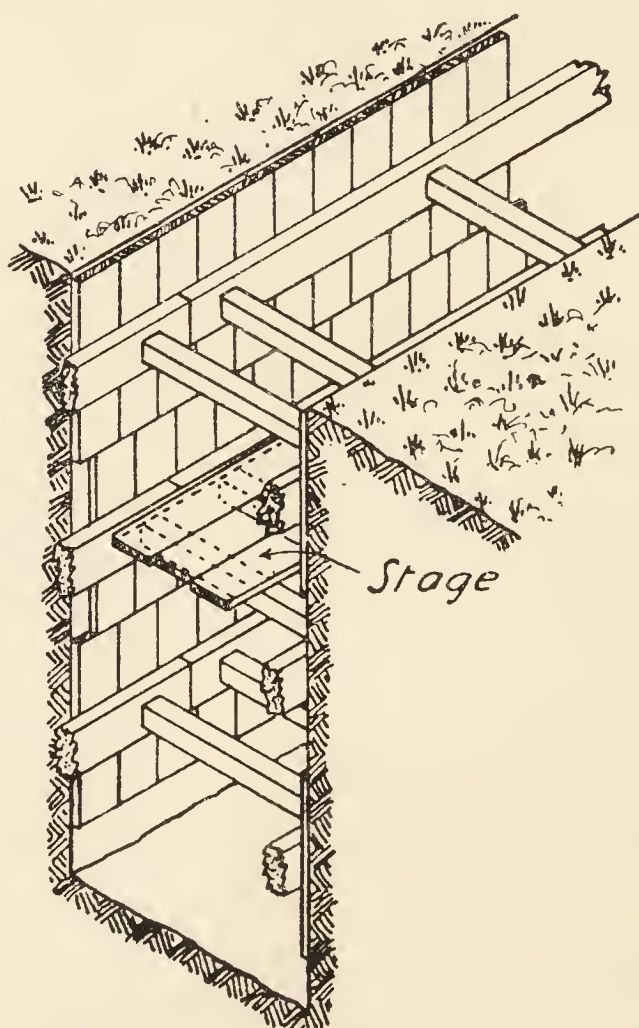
Section of deep trench showing close poling boards in tiers, breaking joint, walings, and struts, and stage for receiving materials thrown up in excavating.
